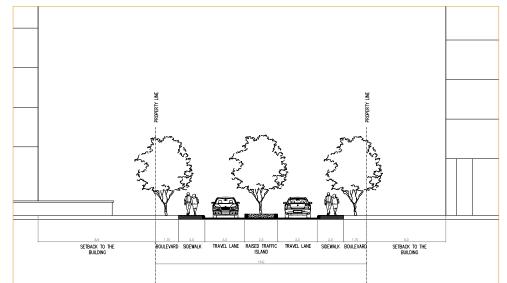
Illustrative Streetscape Section - 16m Private Condo Road
